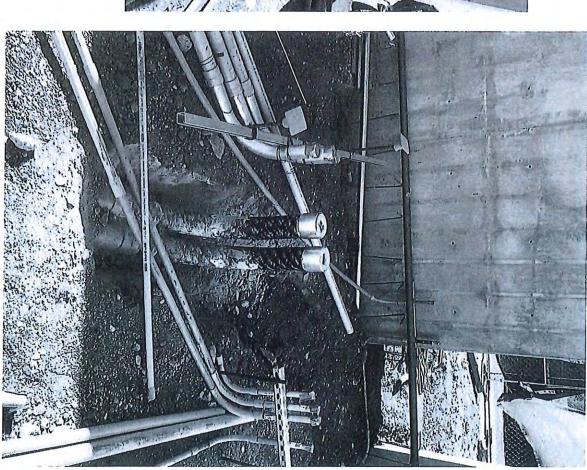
PHOTO OF EXISTING CONDITIONS- ROOM 2166 VIEW FROM EAST LOOKING WEST
